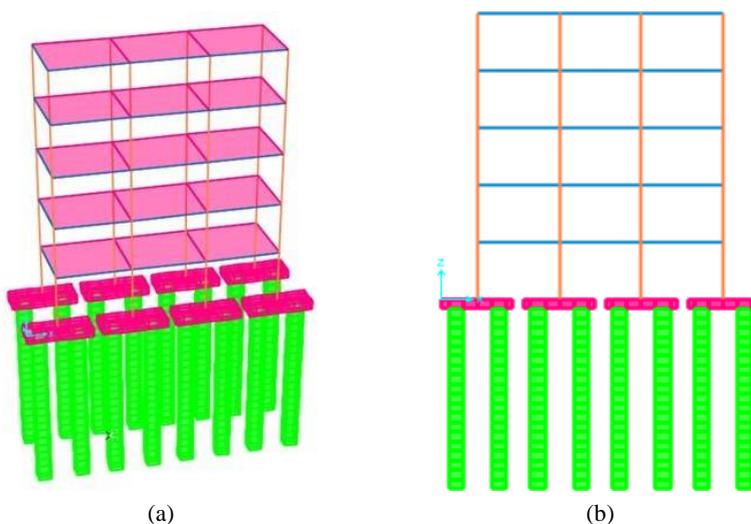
View of pile and pile cap (a) three dimensional; (b) elevational view
